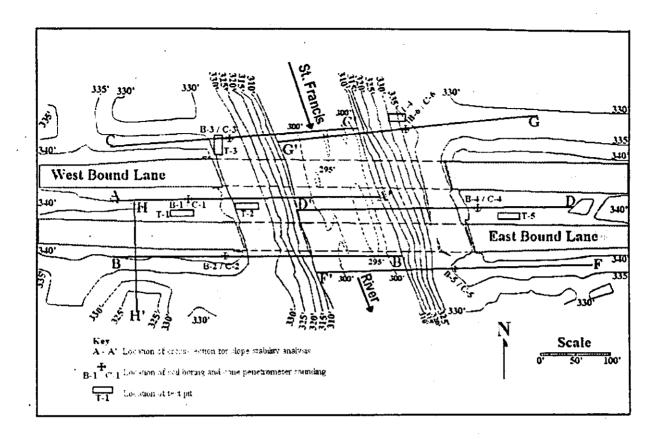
St. Francis River Site Topography, Cross-Sections and Boring Locations
